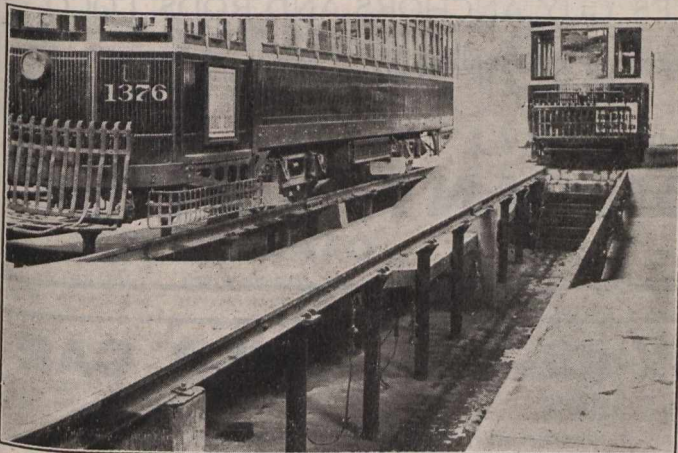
Depressed Devil-strip for Side Inspection of Trucks.
